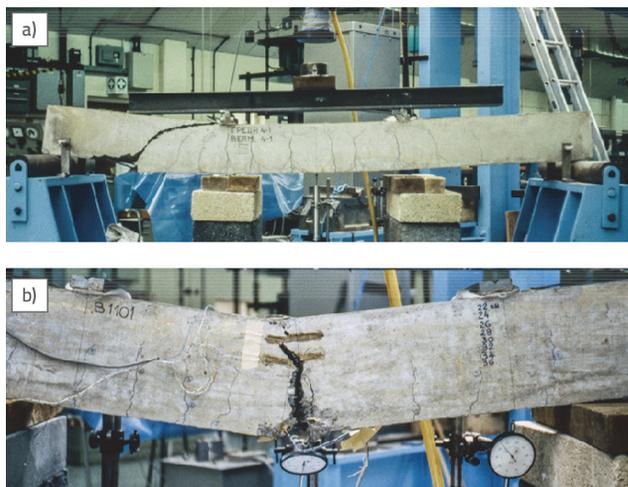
Failure mode of: a) RB-PC beams; b) RB-SF beams
